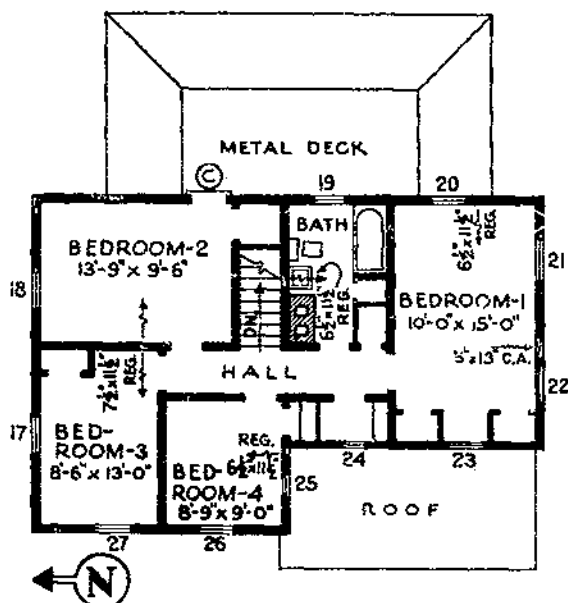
Second-floor plan of house 5-R, showing location of warm-air registers and cold-air returns.
